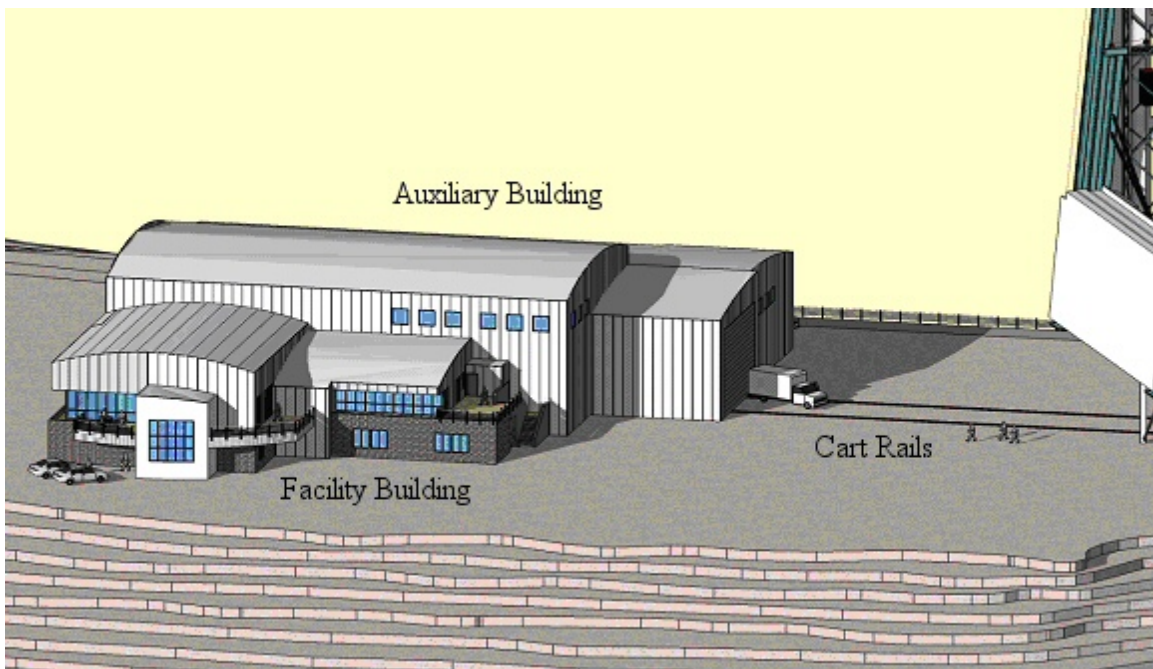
Facility and Auxiliary Buildings. The Facility Building provides office and lab space. The Auxiliary Building has bays for storing and working on instruments and the mirror re-coating plant.
